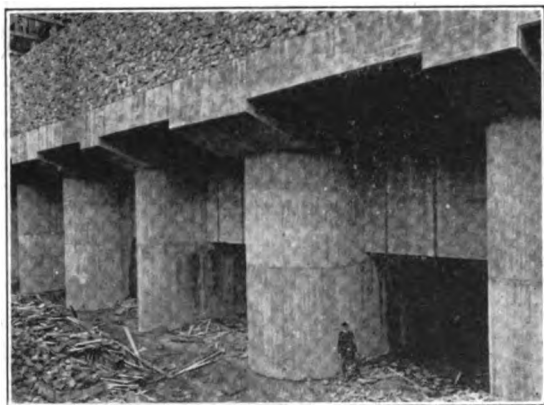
TAILRACE DISCHARGE OPENINGS THROUGH POWER HOUSE FOUNDATIONS SHOWING CONCRETE SUPPORTING PIERS
